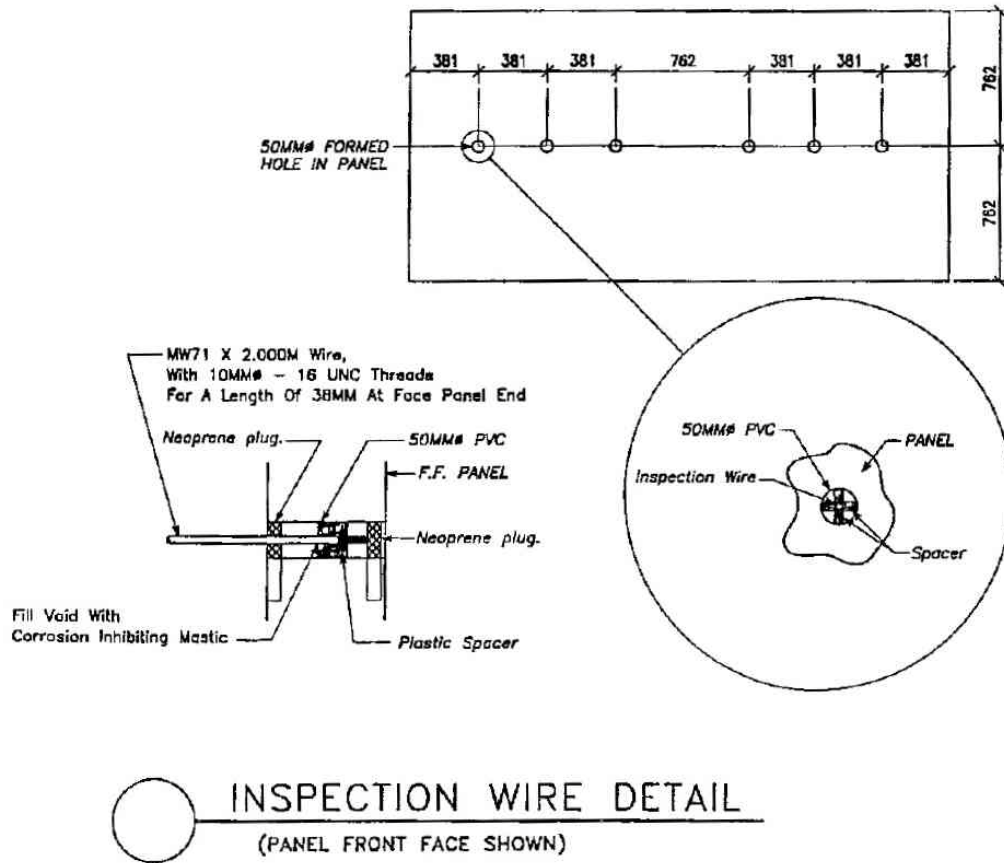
Typical detail for the installation of steel wire coupons for the I-15 Corridor Reconstruction Project
